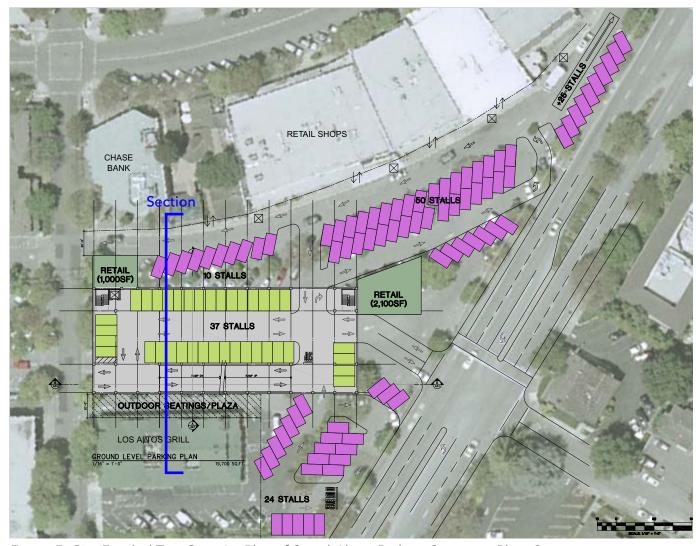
City-Funded Test Case 1—Plan of Stand-Alone Parking Structure, Plaza 3
